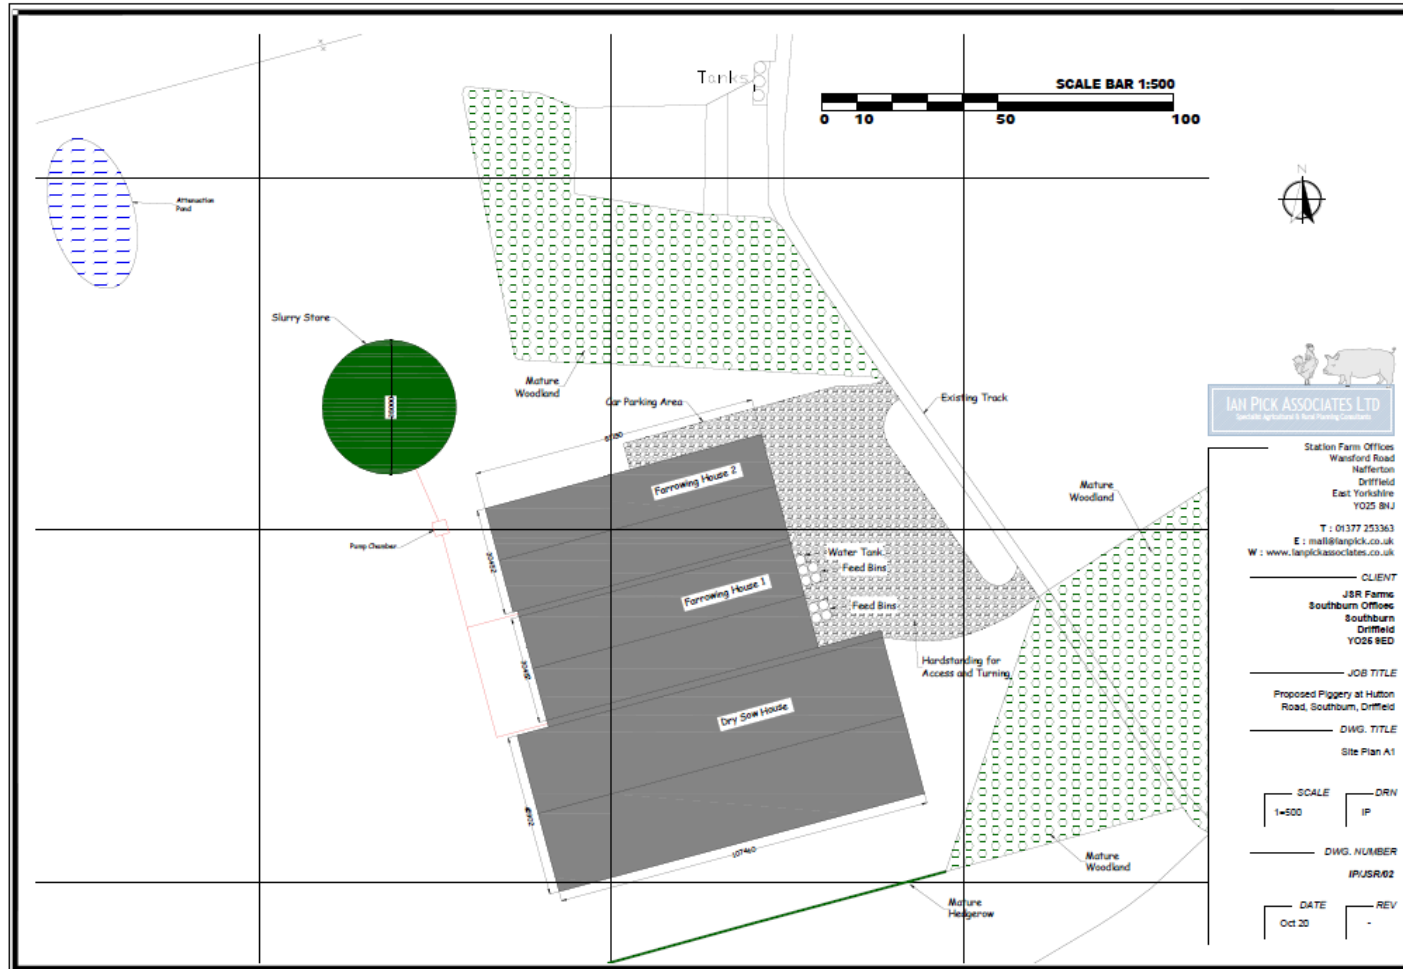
shows an overview of the site plan including the buildings, slurry and attenuation pond with the surrounding woodlands and land to scale.
